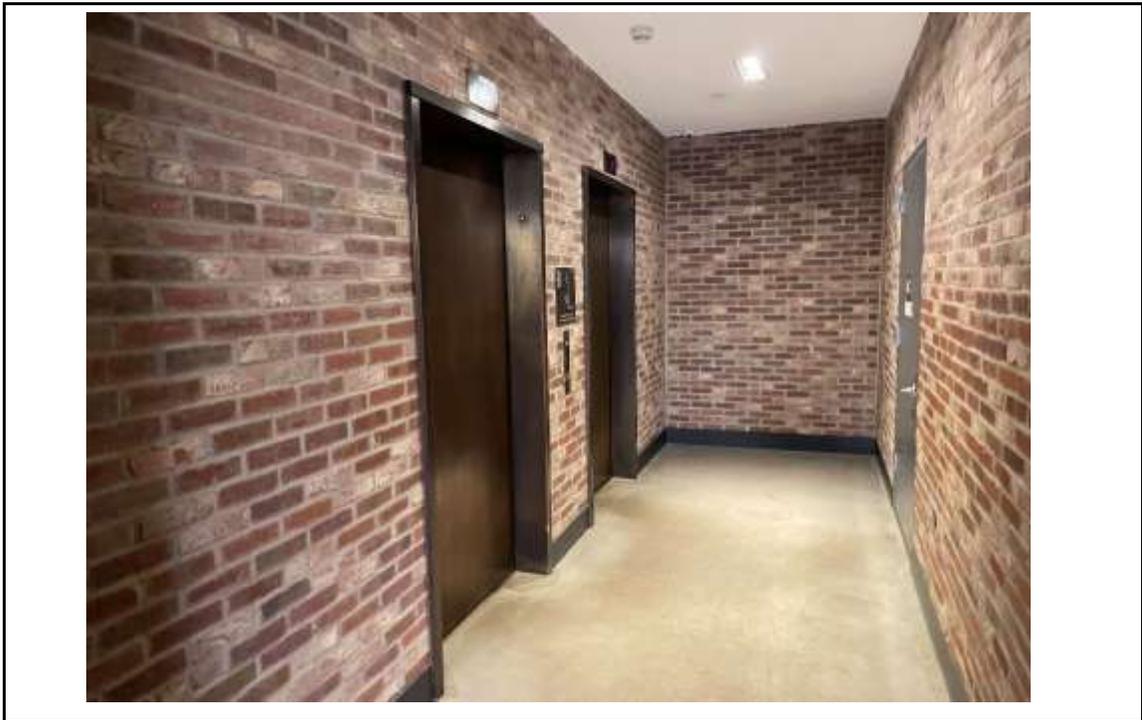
First floor concrete slab covered with flooring, facing west. 02 March 2023.
